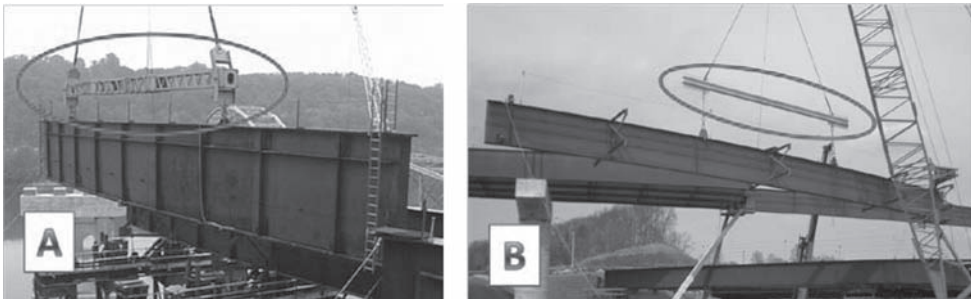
Lifting Beams, a) Truss type, b) W-shape beam type.
